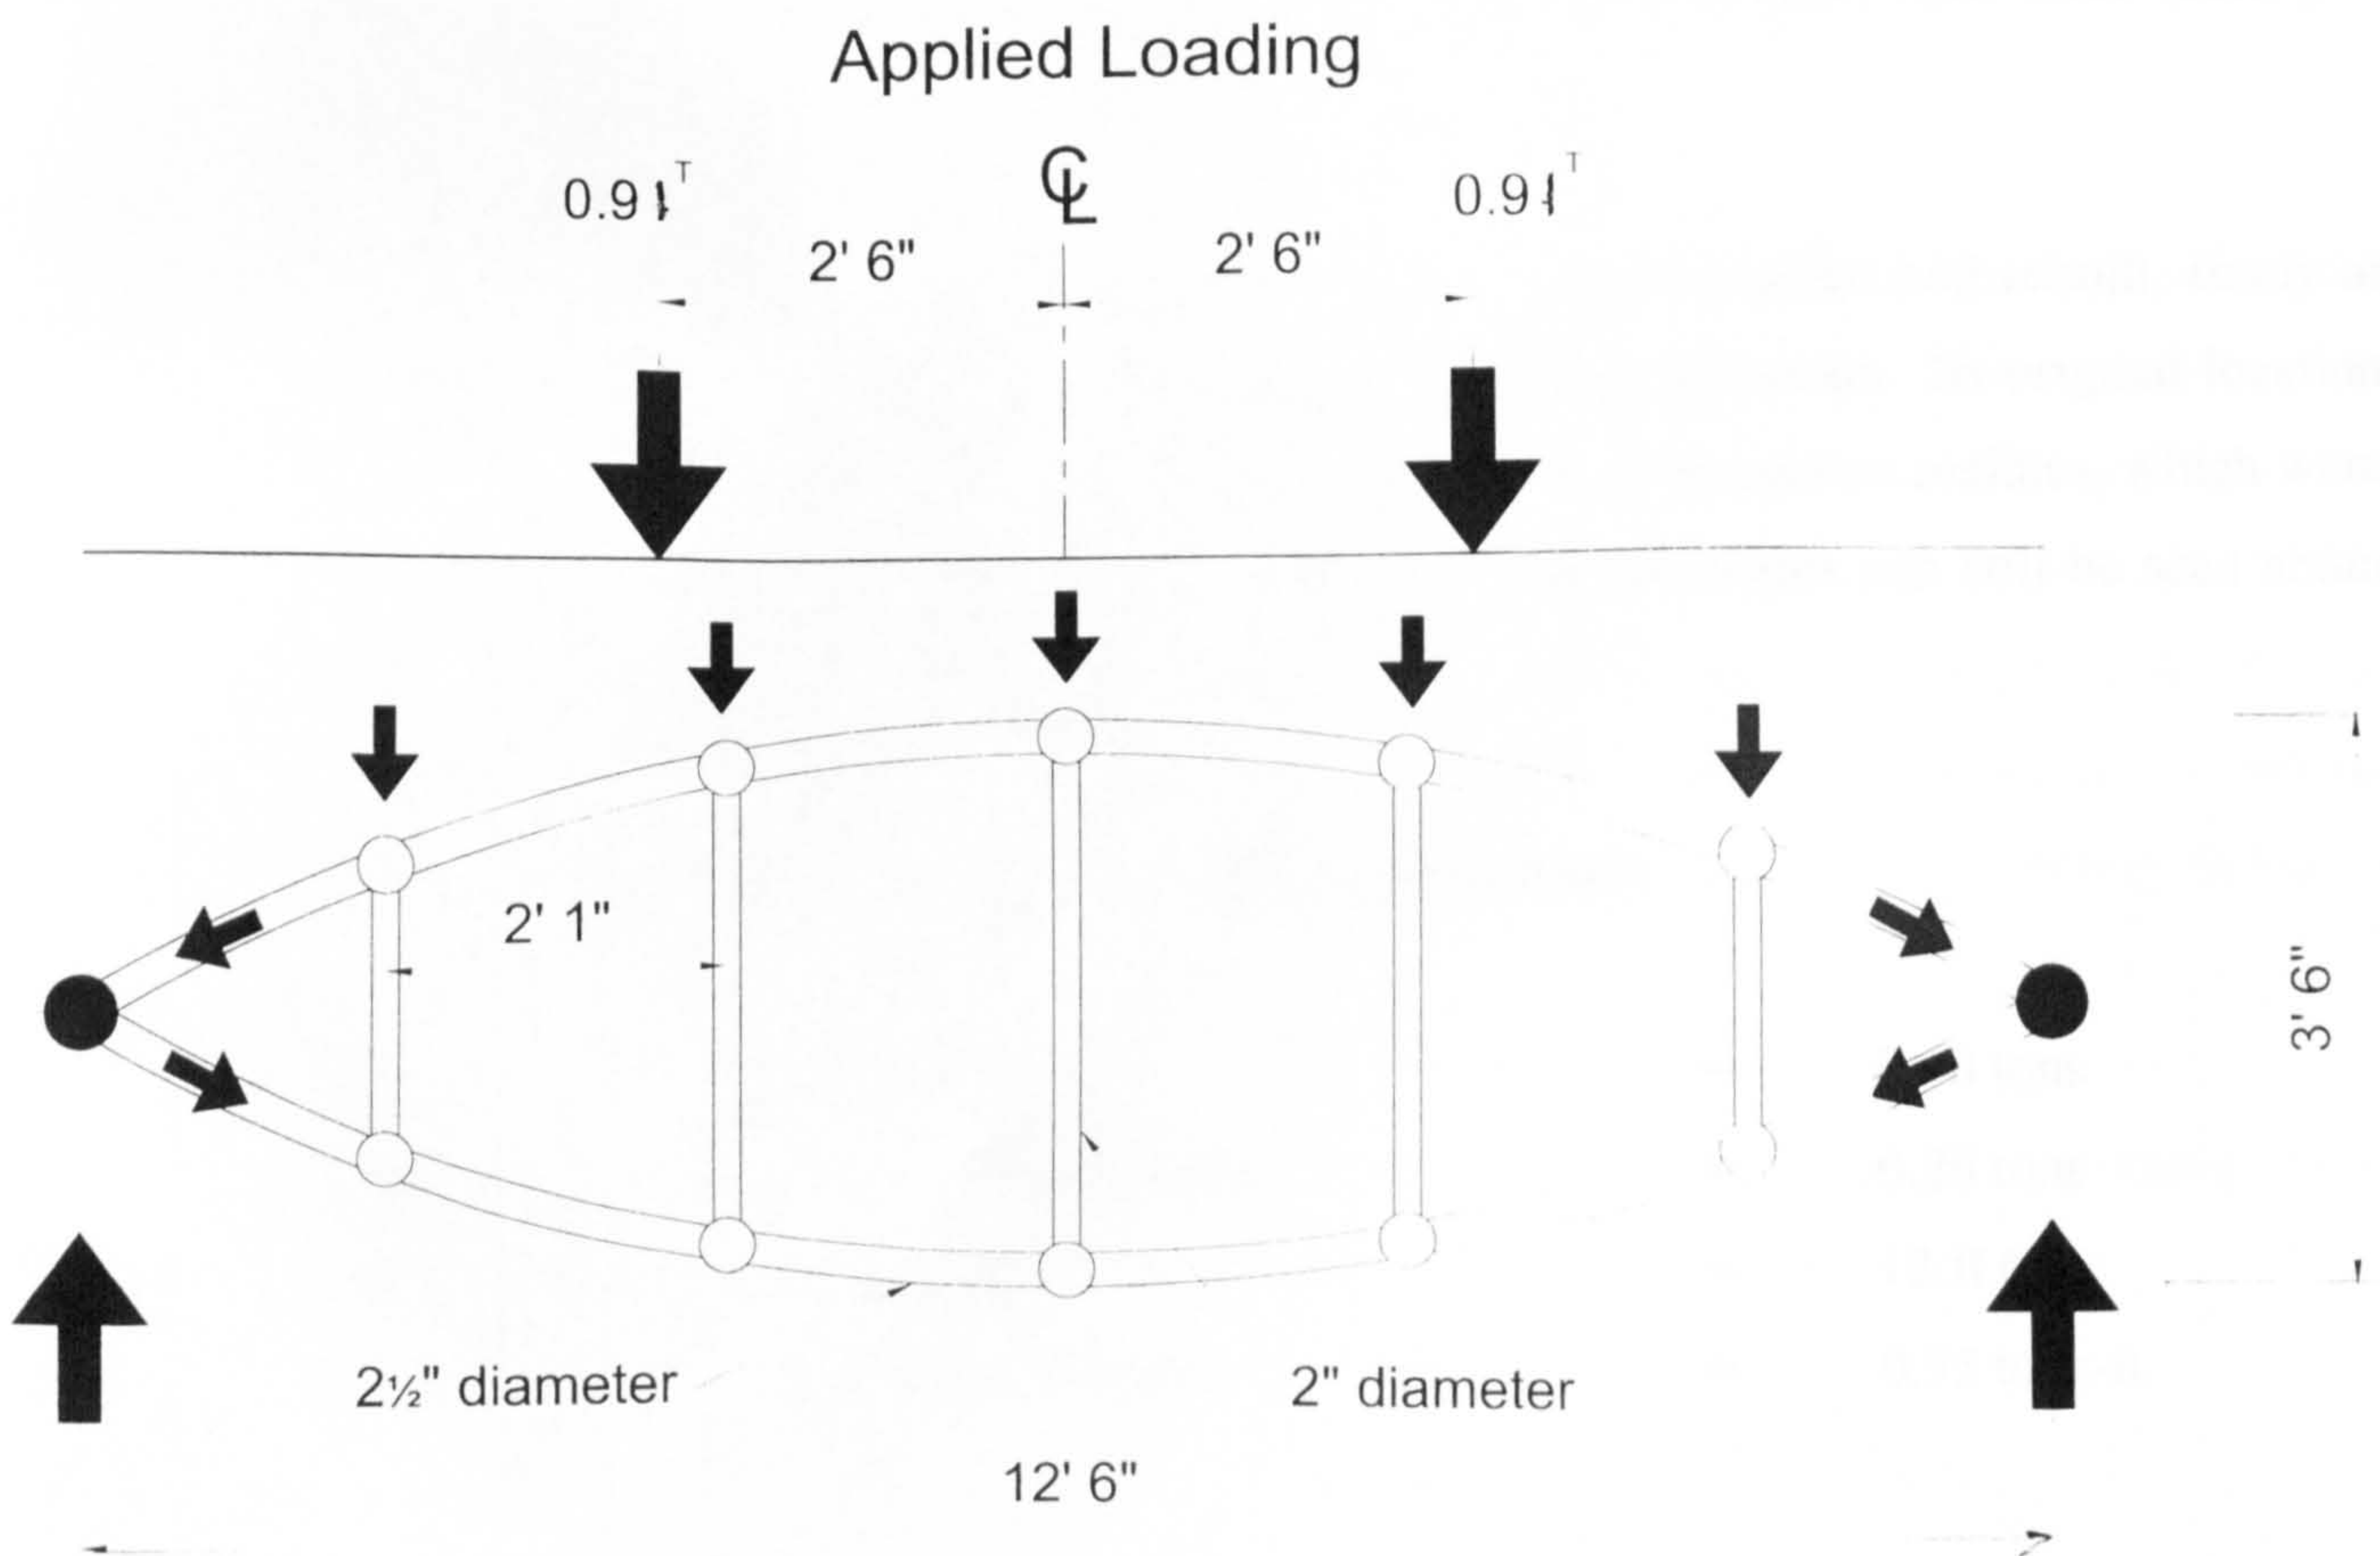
Gaunless Bridge. Applied loads and forces in truss
